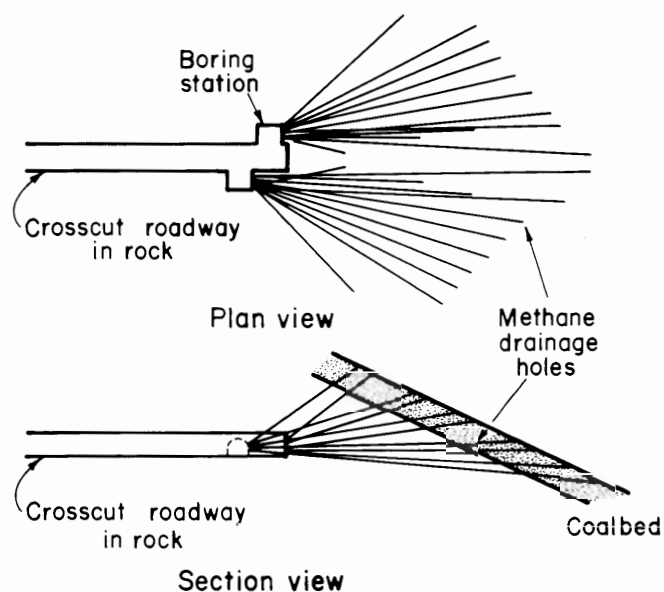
Schematic plan and section views of methane drainage boreholes drilled from crosscut driven perpendicular to strike to intercept coalbed, Japan (modified from Ohga and Higuchi (73)).
